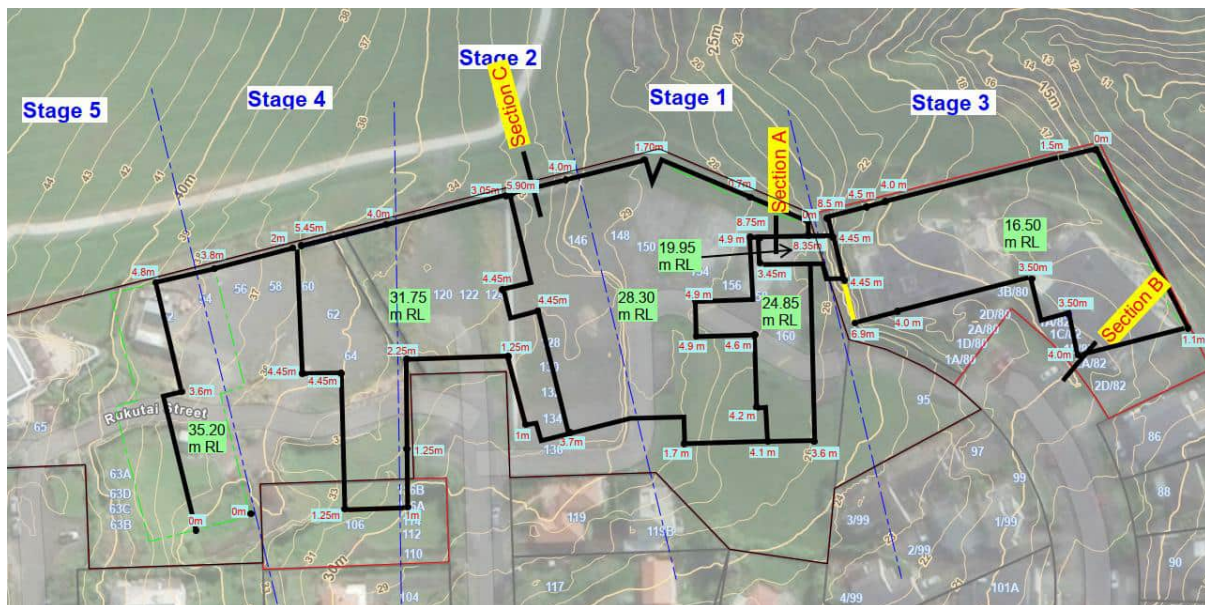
Analyses section locations adopted for preliminary design of temporary retaining walls
